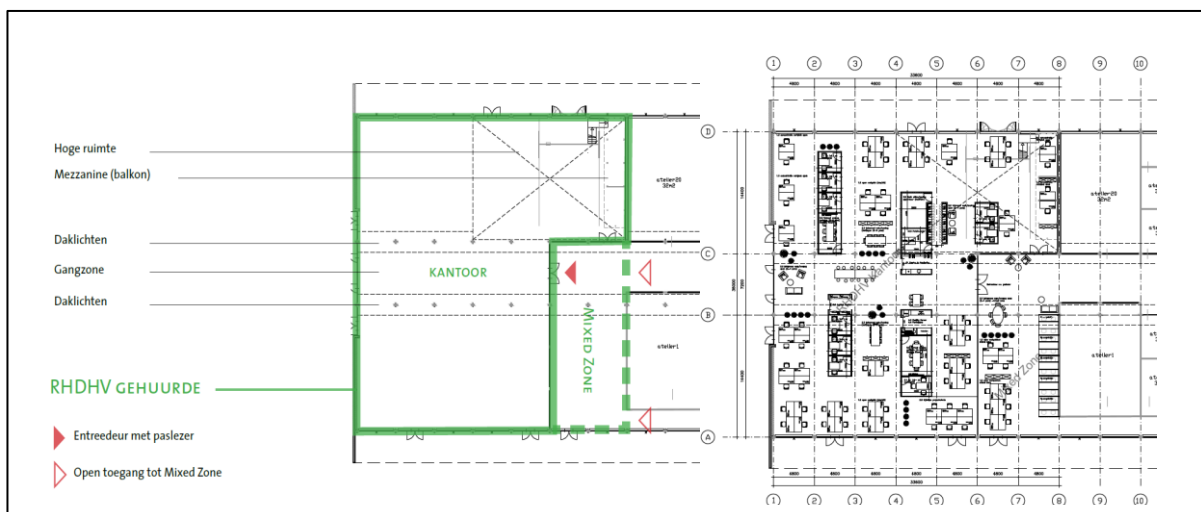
Floorplan of the RHDHV office in DE STEK building, retrieved from (RHDHV, 2020).
